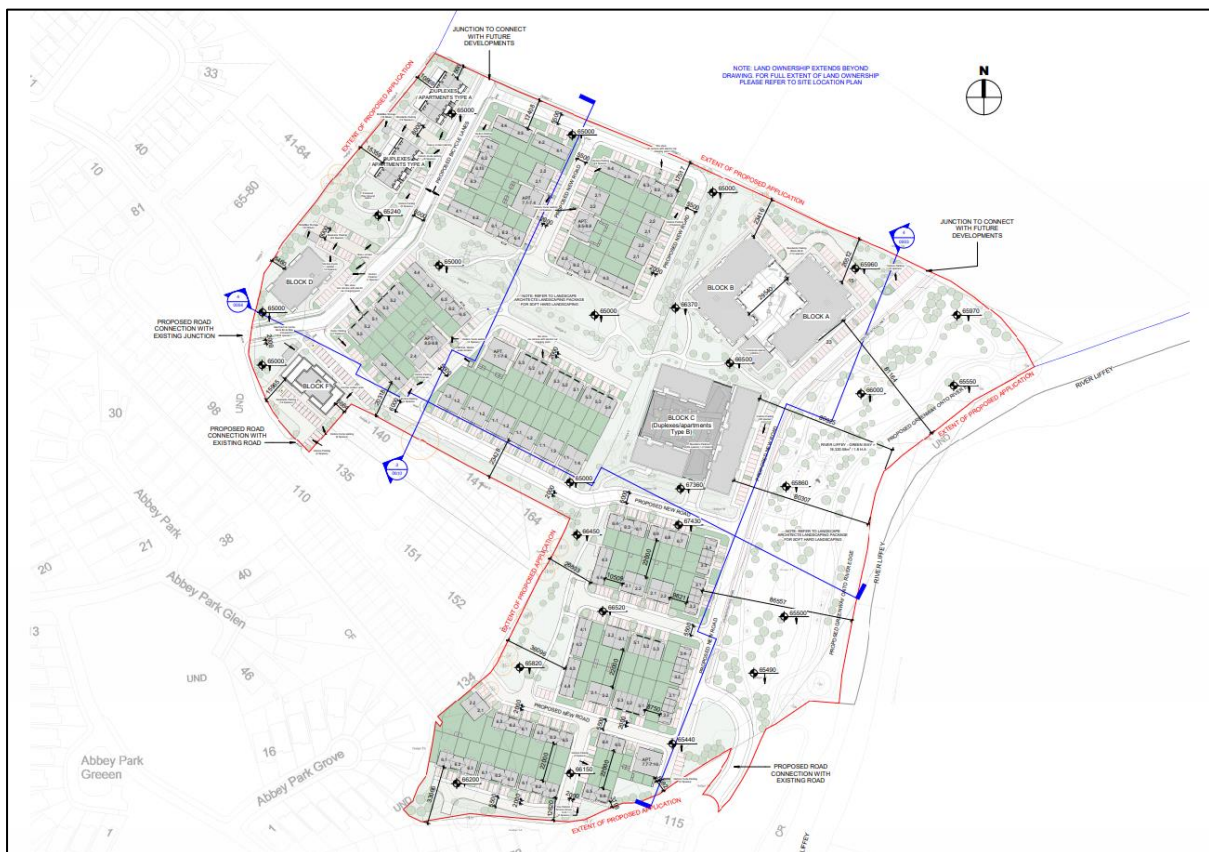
Site layout plan of proposed development of 333 no. residential dwellings.
